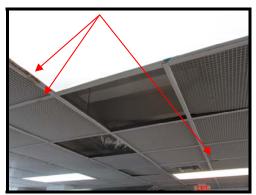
Building 3 men's locker room showing rusted grid and broken ceiling tiles
